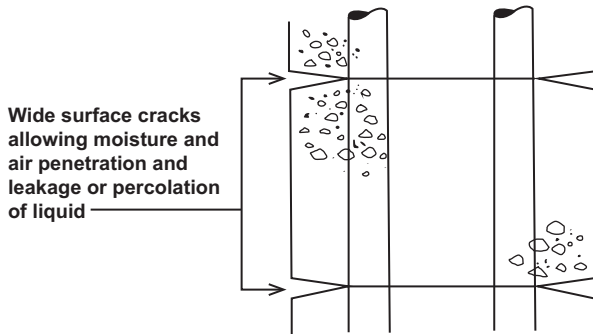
Tension in floor of a long tank with cantilever walls.
